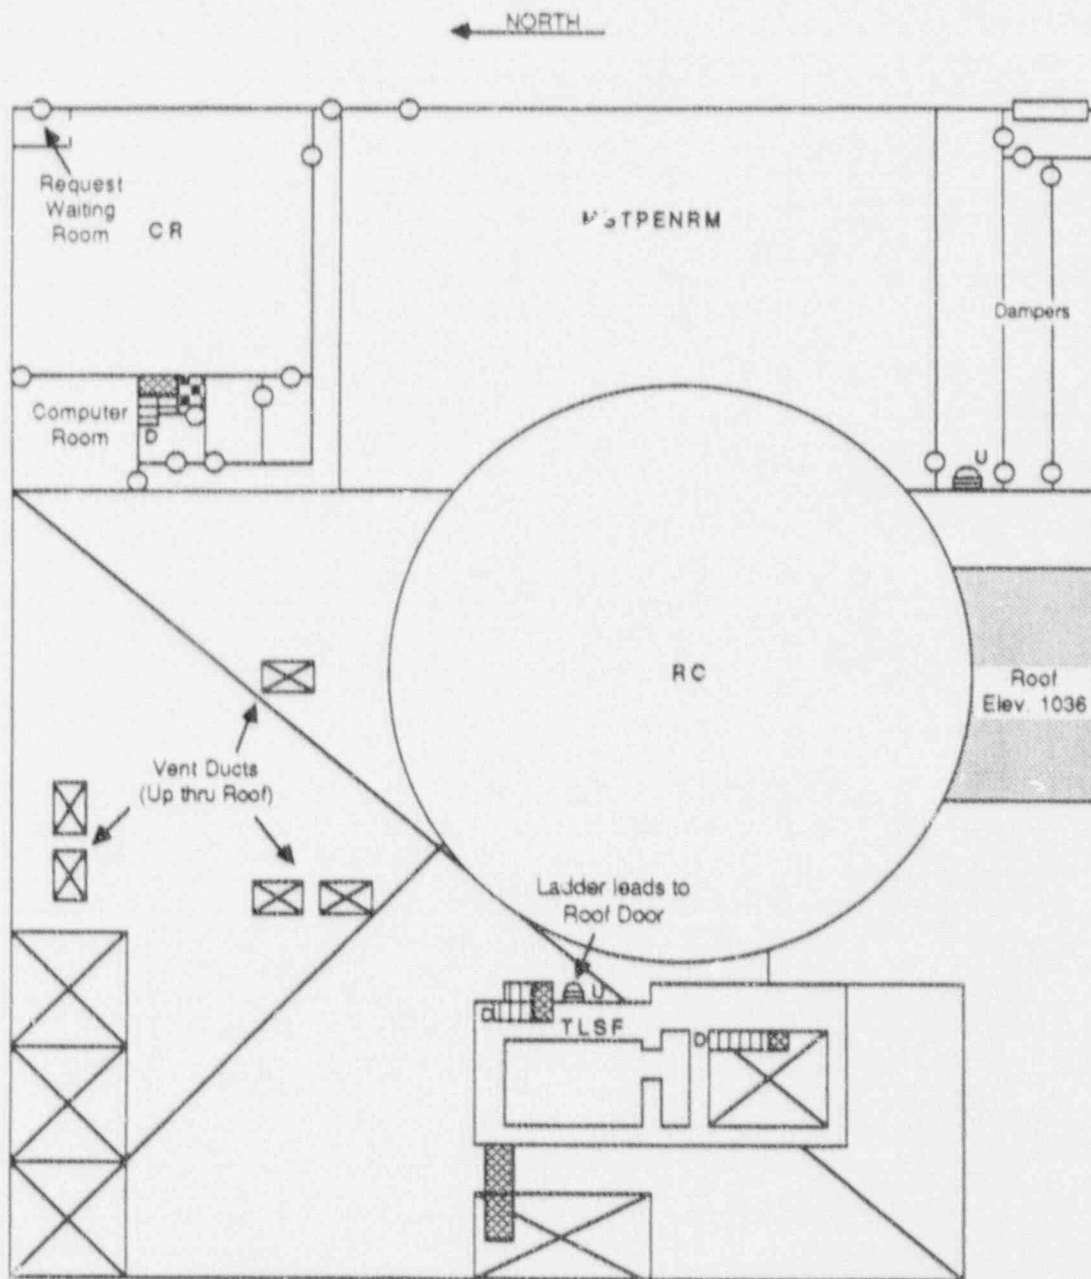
Fort Calhoun Auxiliary Building & Containment Operating Floor (Elevation 1035')
